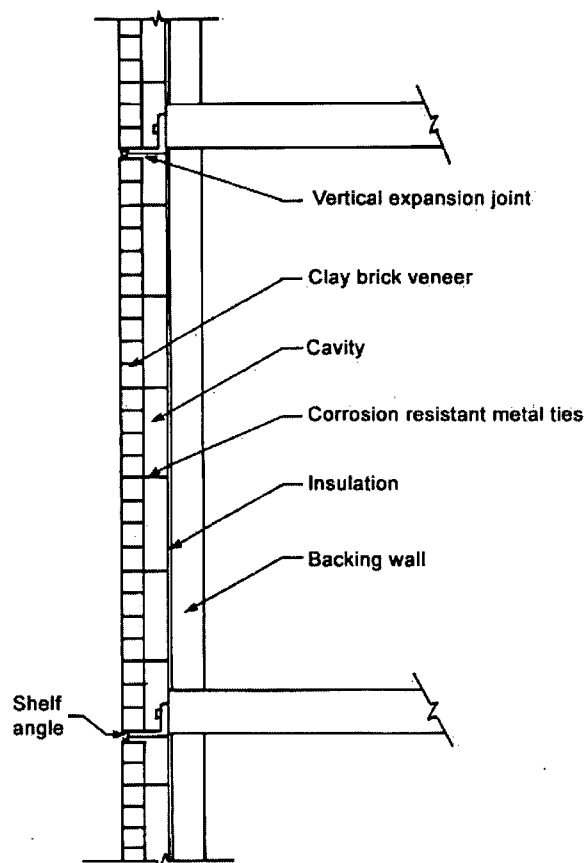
Typical masonry veneer attached to a backup wall. (From Ref. 27)
